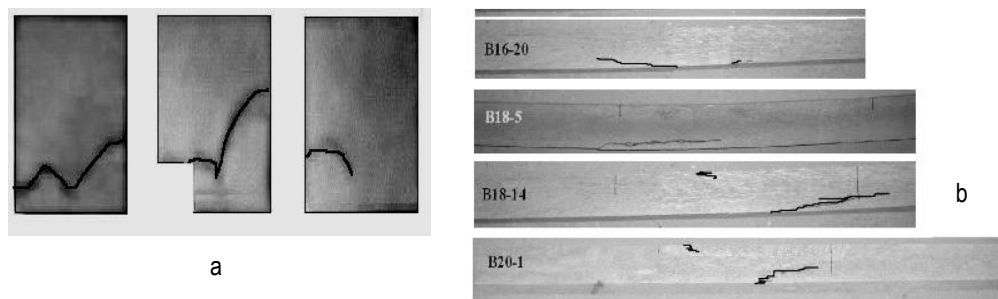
(a) Transversal crack pattern of flexure and shear failure area
